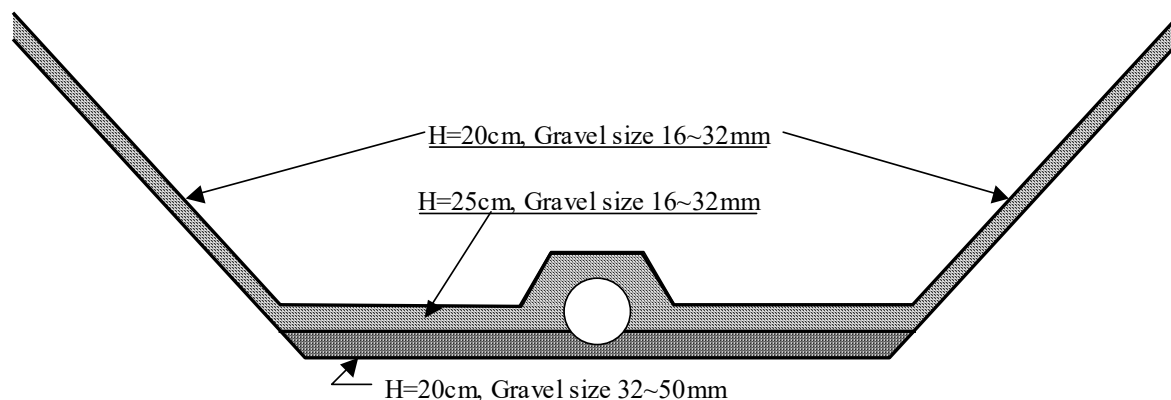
The bottom drainage layer structure and the drainage material (installed in Zahart Al Finjan landfill as an example).
